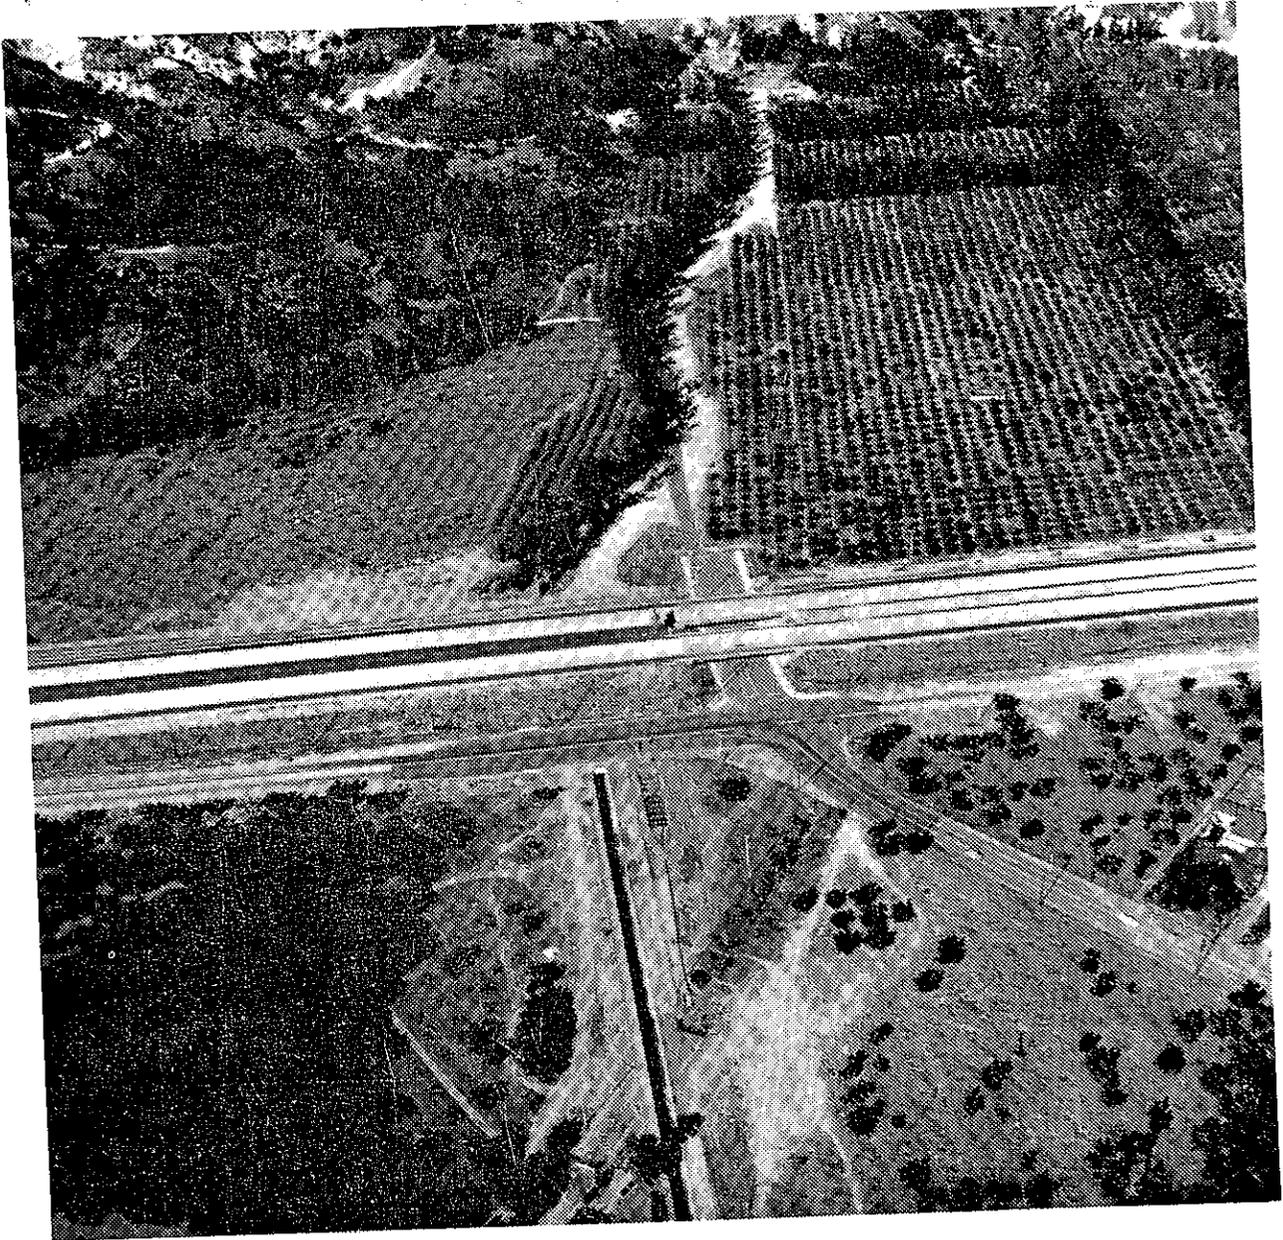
Looking northerly at the Glenoaks Boulevard Undercrossing.
